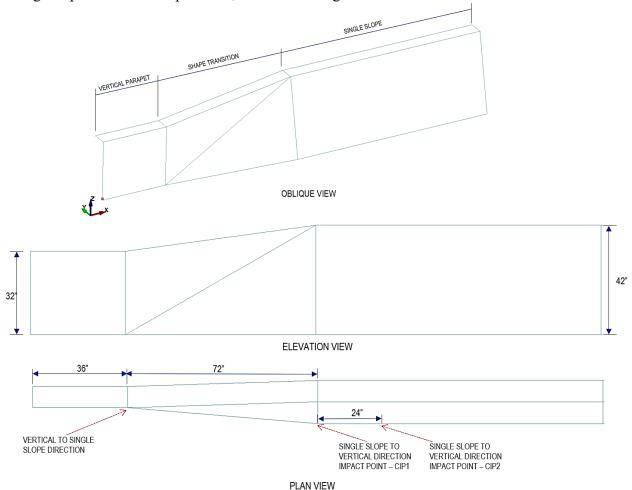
Vertical to Single Slope Barrier Shape Transition Design and Impact Points
